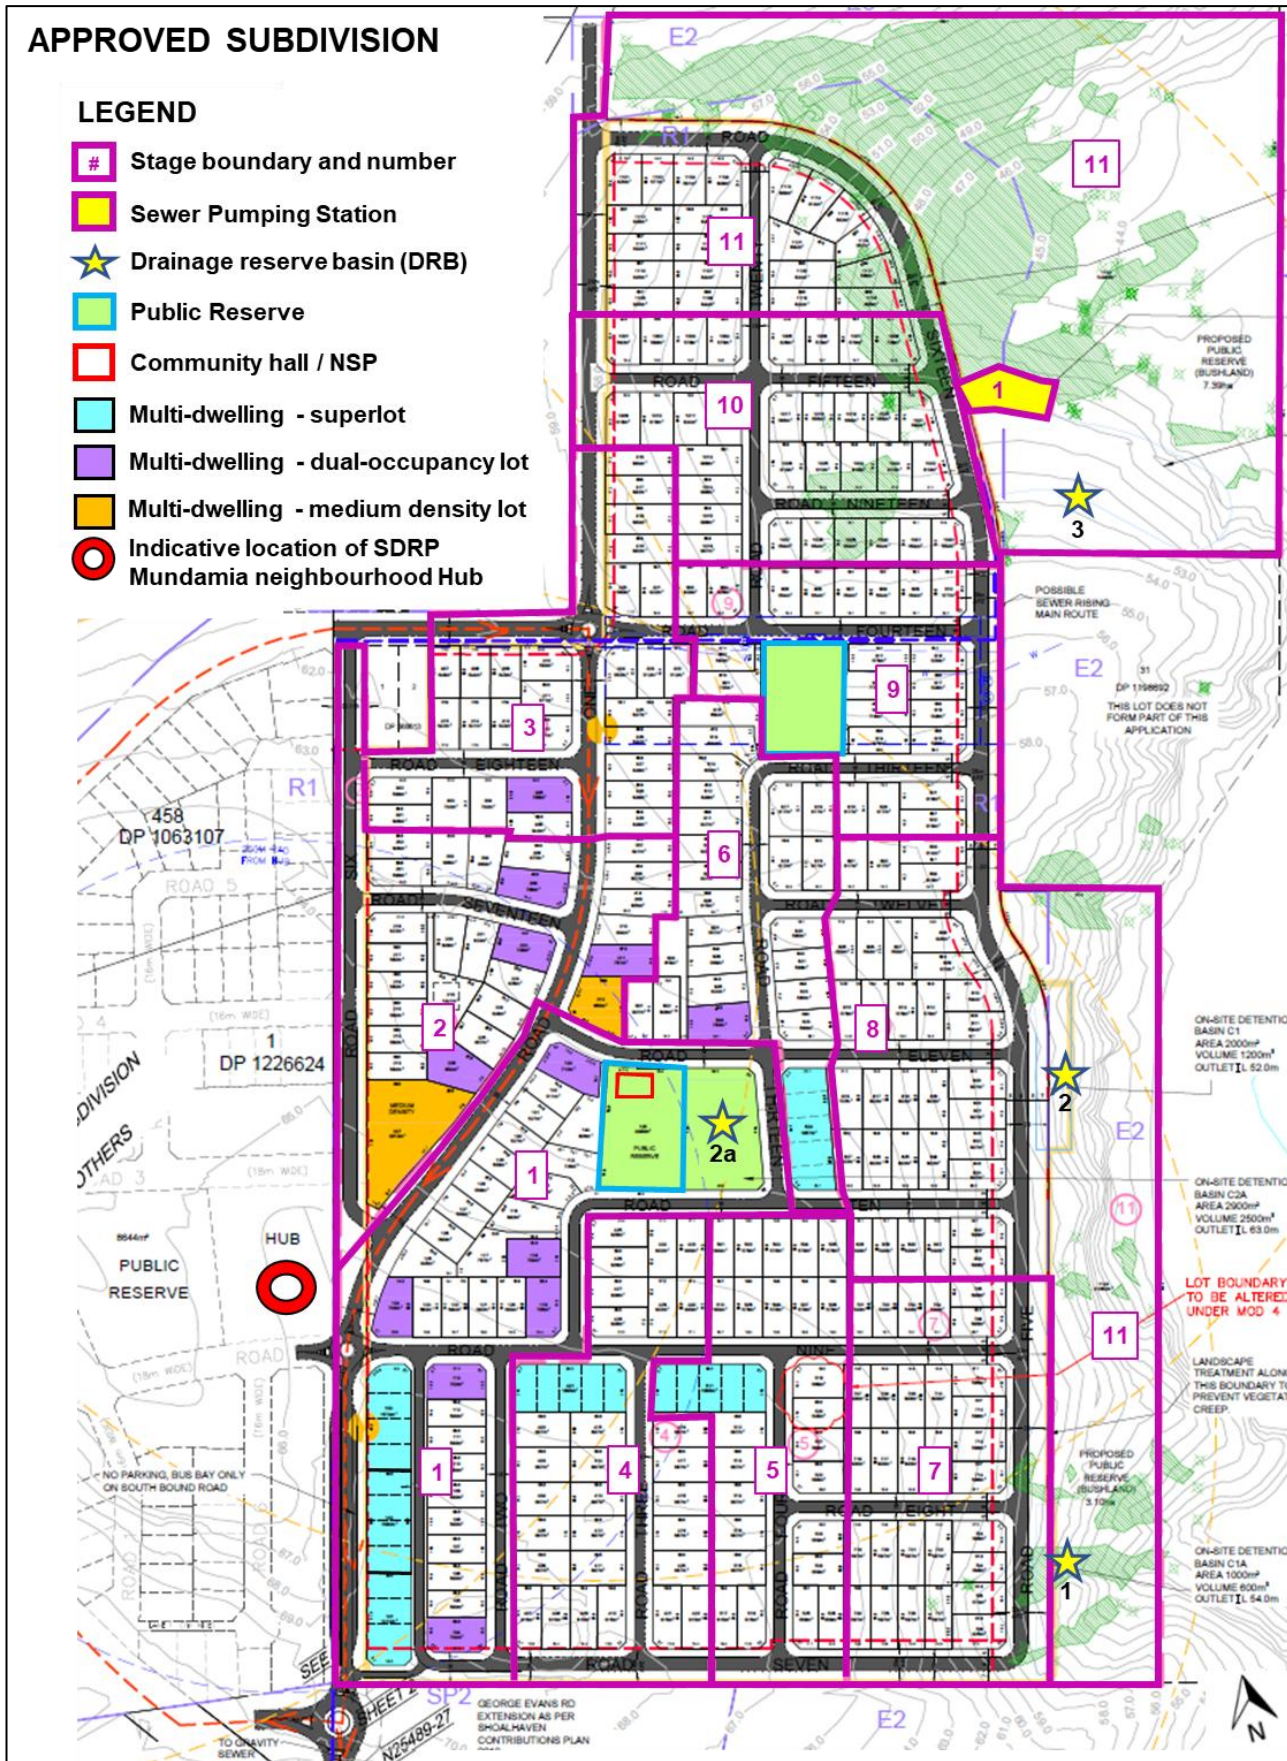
| Approved subdivision layout (Base source: SSD-7169 MOD 4)
